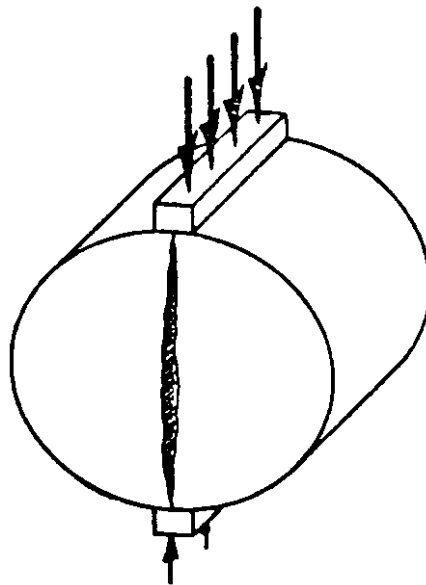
B. Specimen Failing in Tension Under Compressive Load [5].
